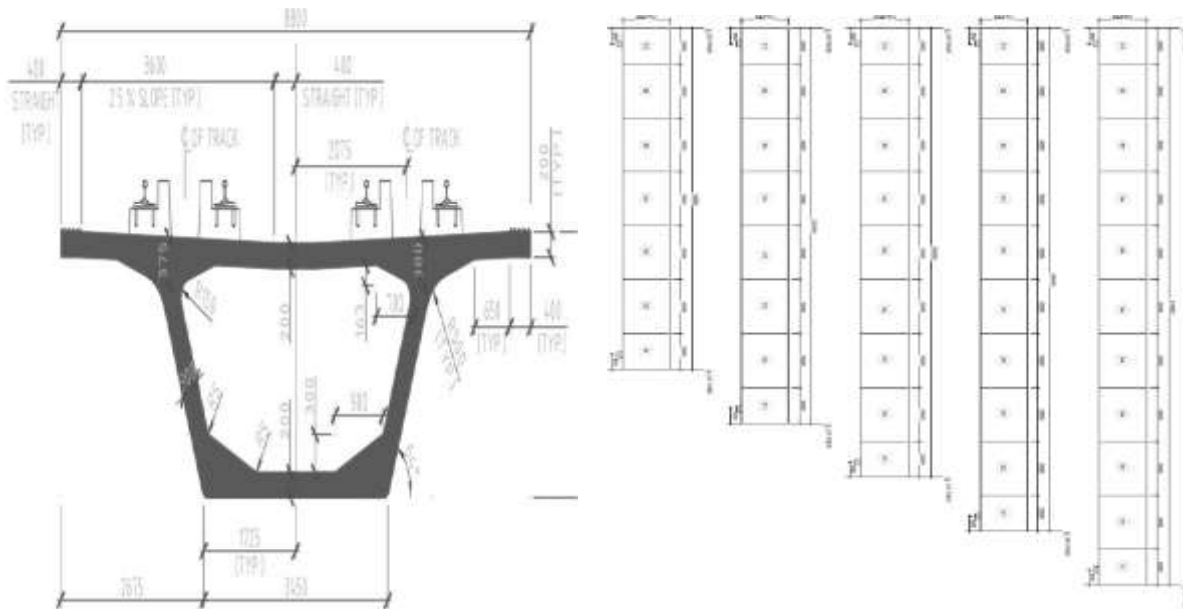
Typical Cross section of PSC segmental box girder and Arrangement of segments S1 to S4 for spans 19m to 31m
